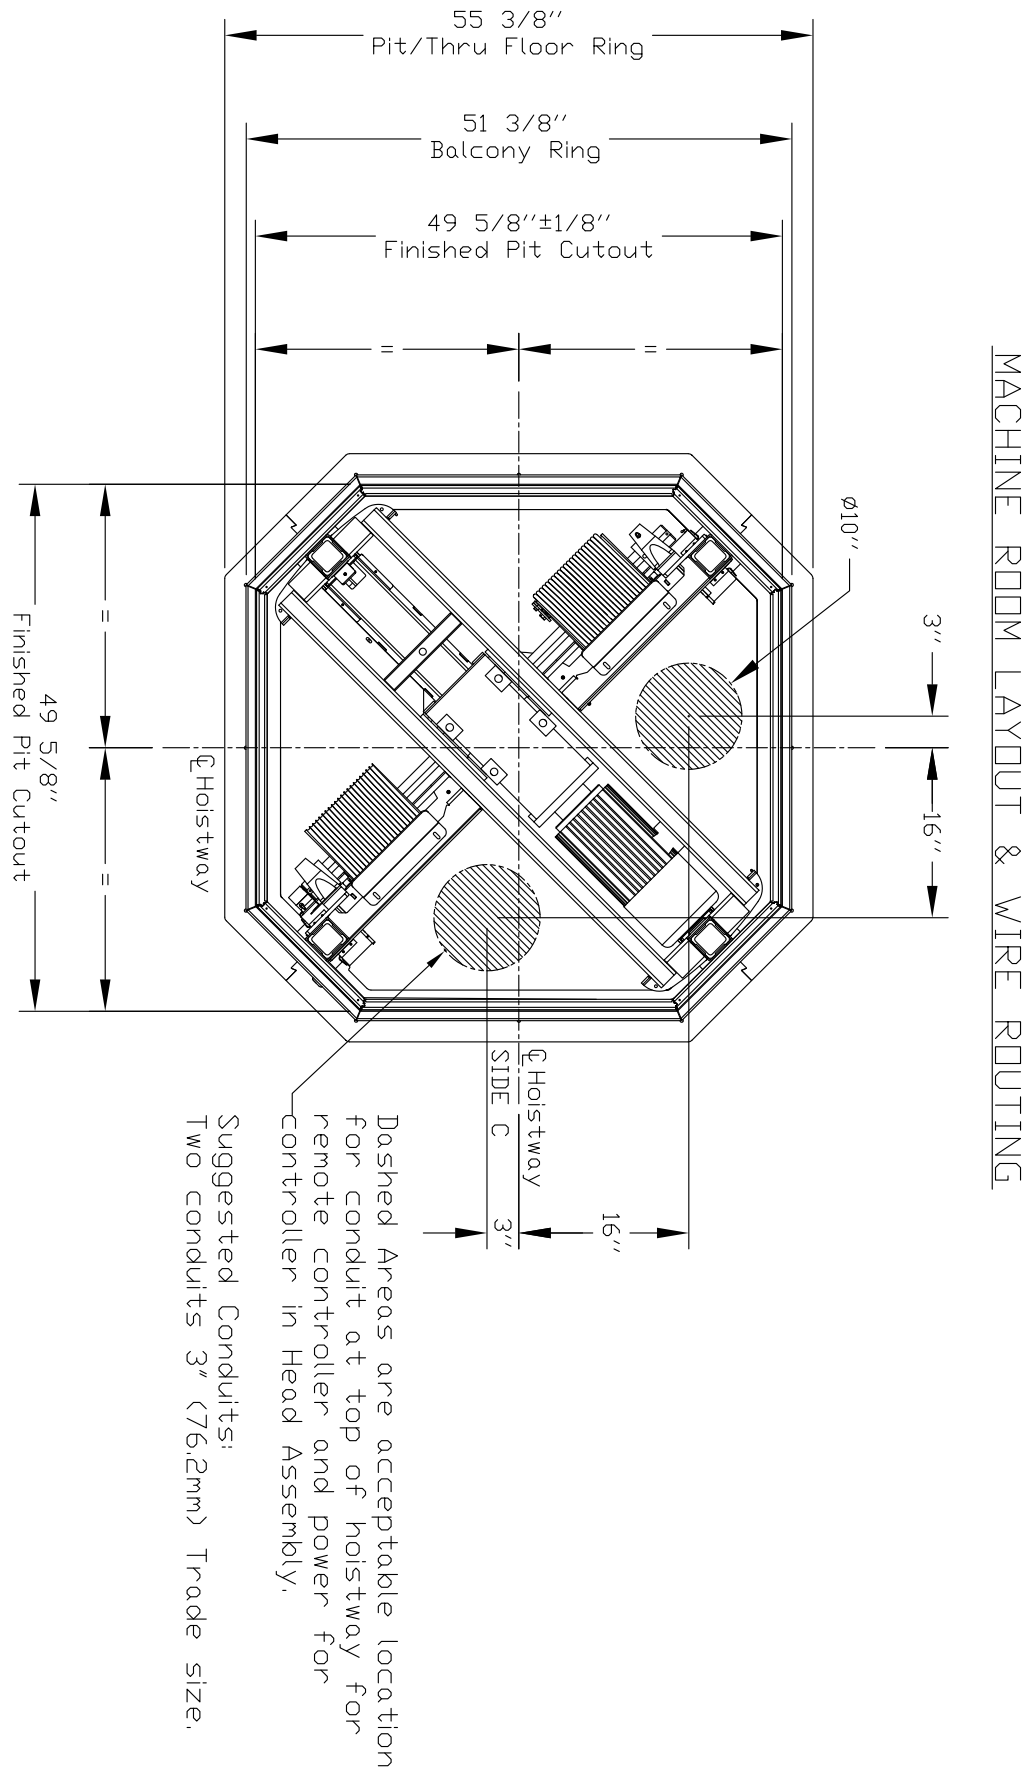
Pit cutout/thru-floor cutout - octagonal glass (OGM) type 1, 2 or 3
